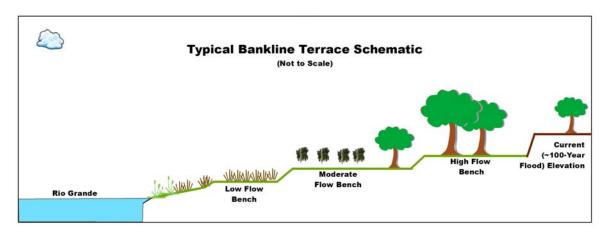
Cross-section of terraced bankline conceptual design at Angostura Arroyo site.
